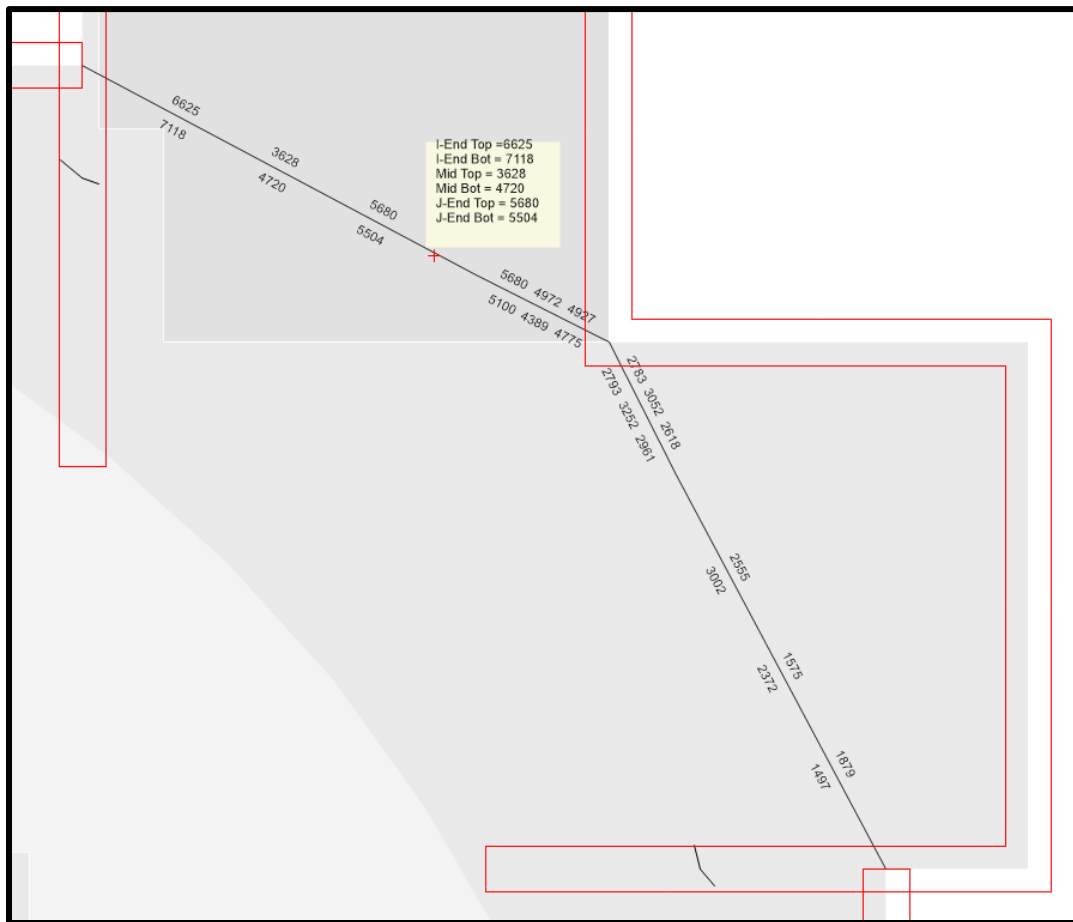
Interior Beam Flexural Longitudinal Reinforcement
